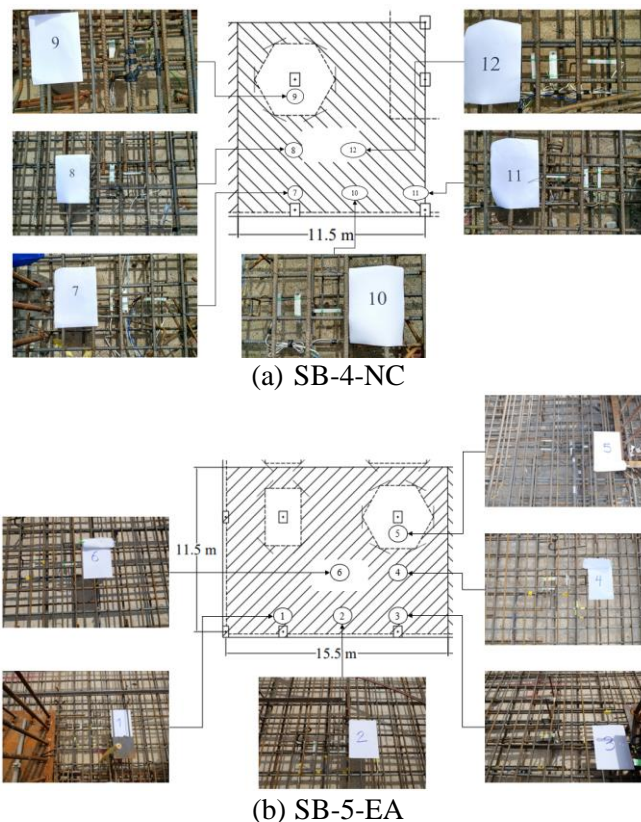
Measurement locations for slabs on beam at construction site 2
